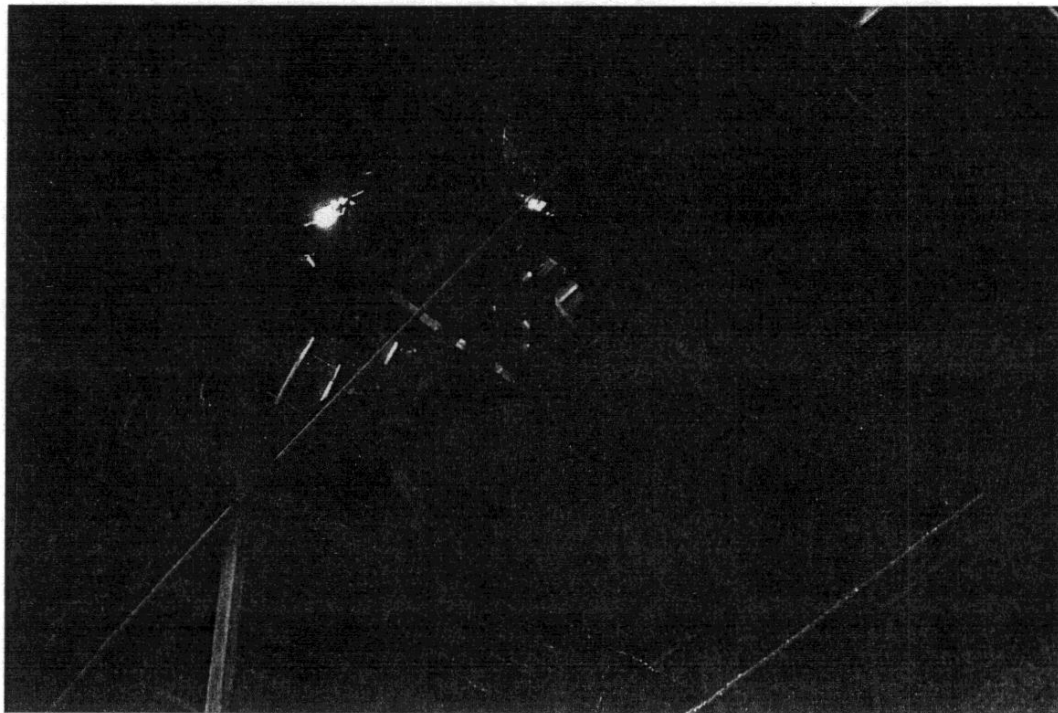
The roof of the malt kiln. This dim view, looking up from the south-east corner, shows the complex timberwork that supports a pyramidal roof inside the present pitched and slated structure.
